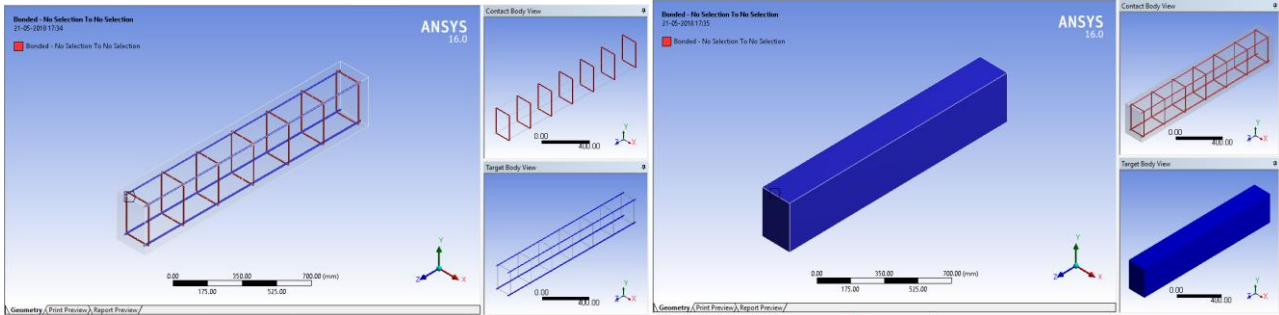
(a) Contact between stirrups and main bars (b) Contact between reinforcement and concrete
